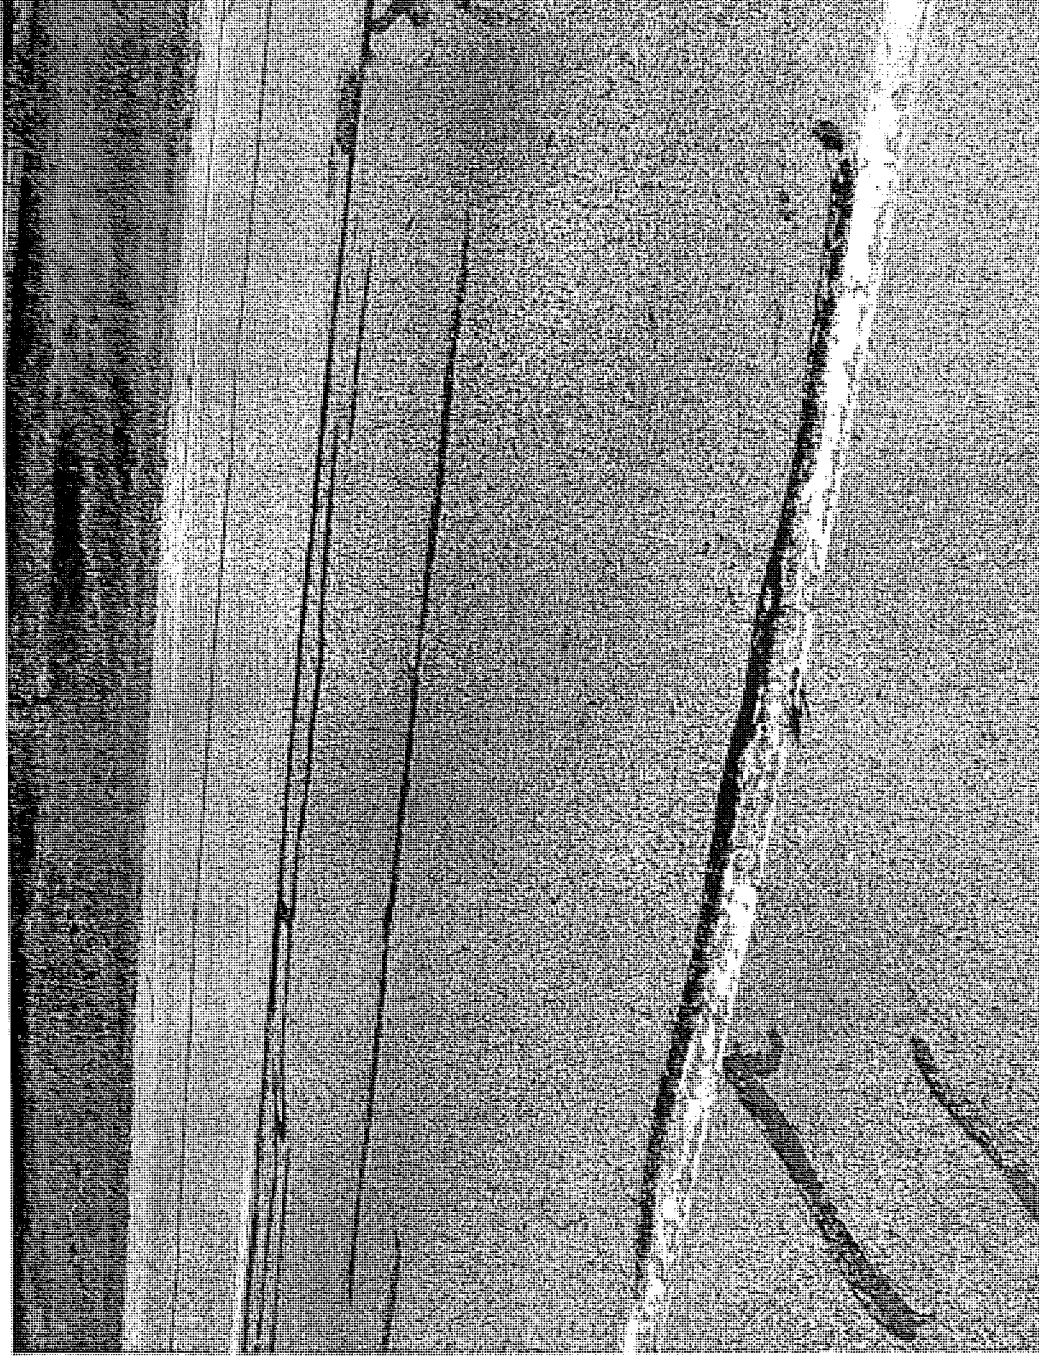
Longitudinal and transverse TDC on I-96 EB Control Section 33084 Job Number 28213 BMP 9.0, EMP 17.5
